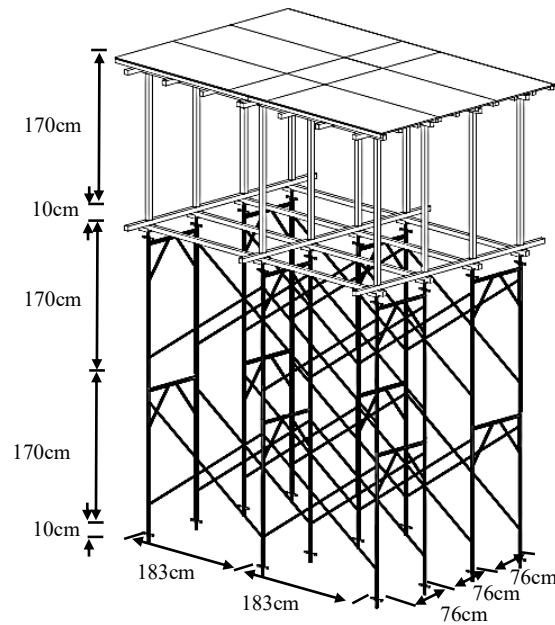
Setup of outdoor loading test of the full-scale combined system of scaffolds and shores
